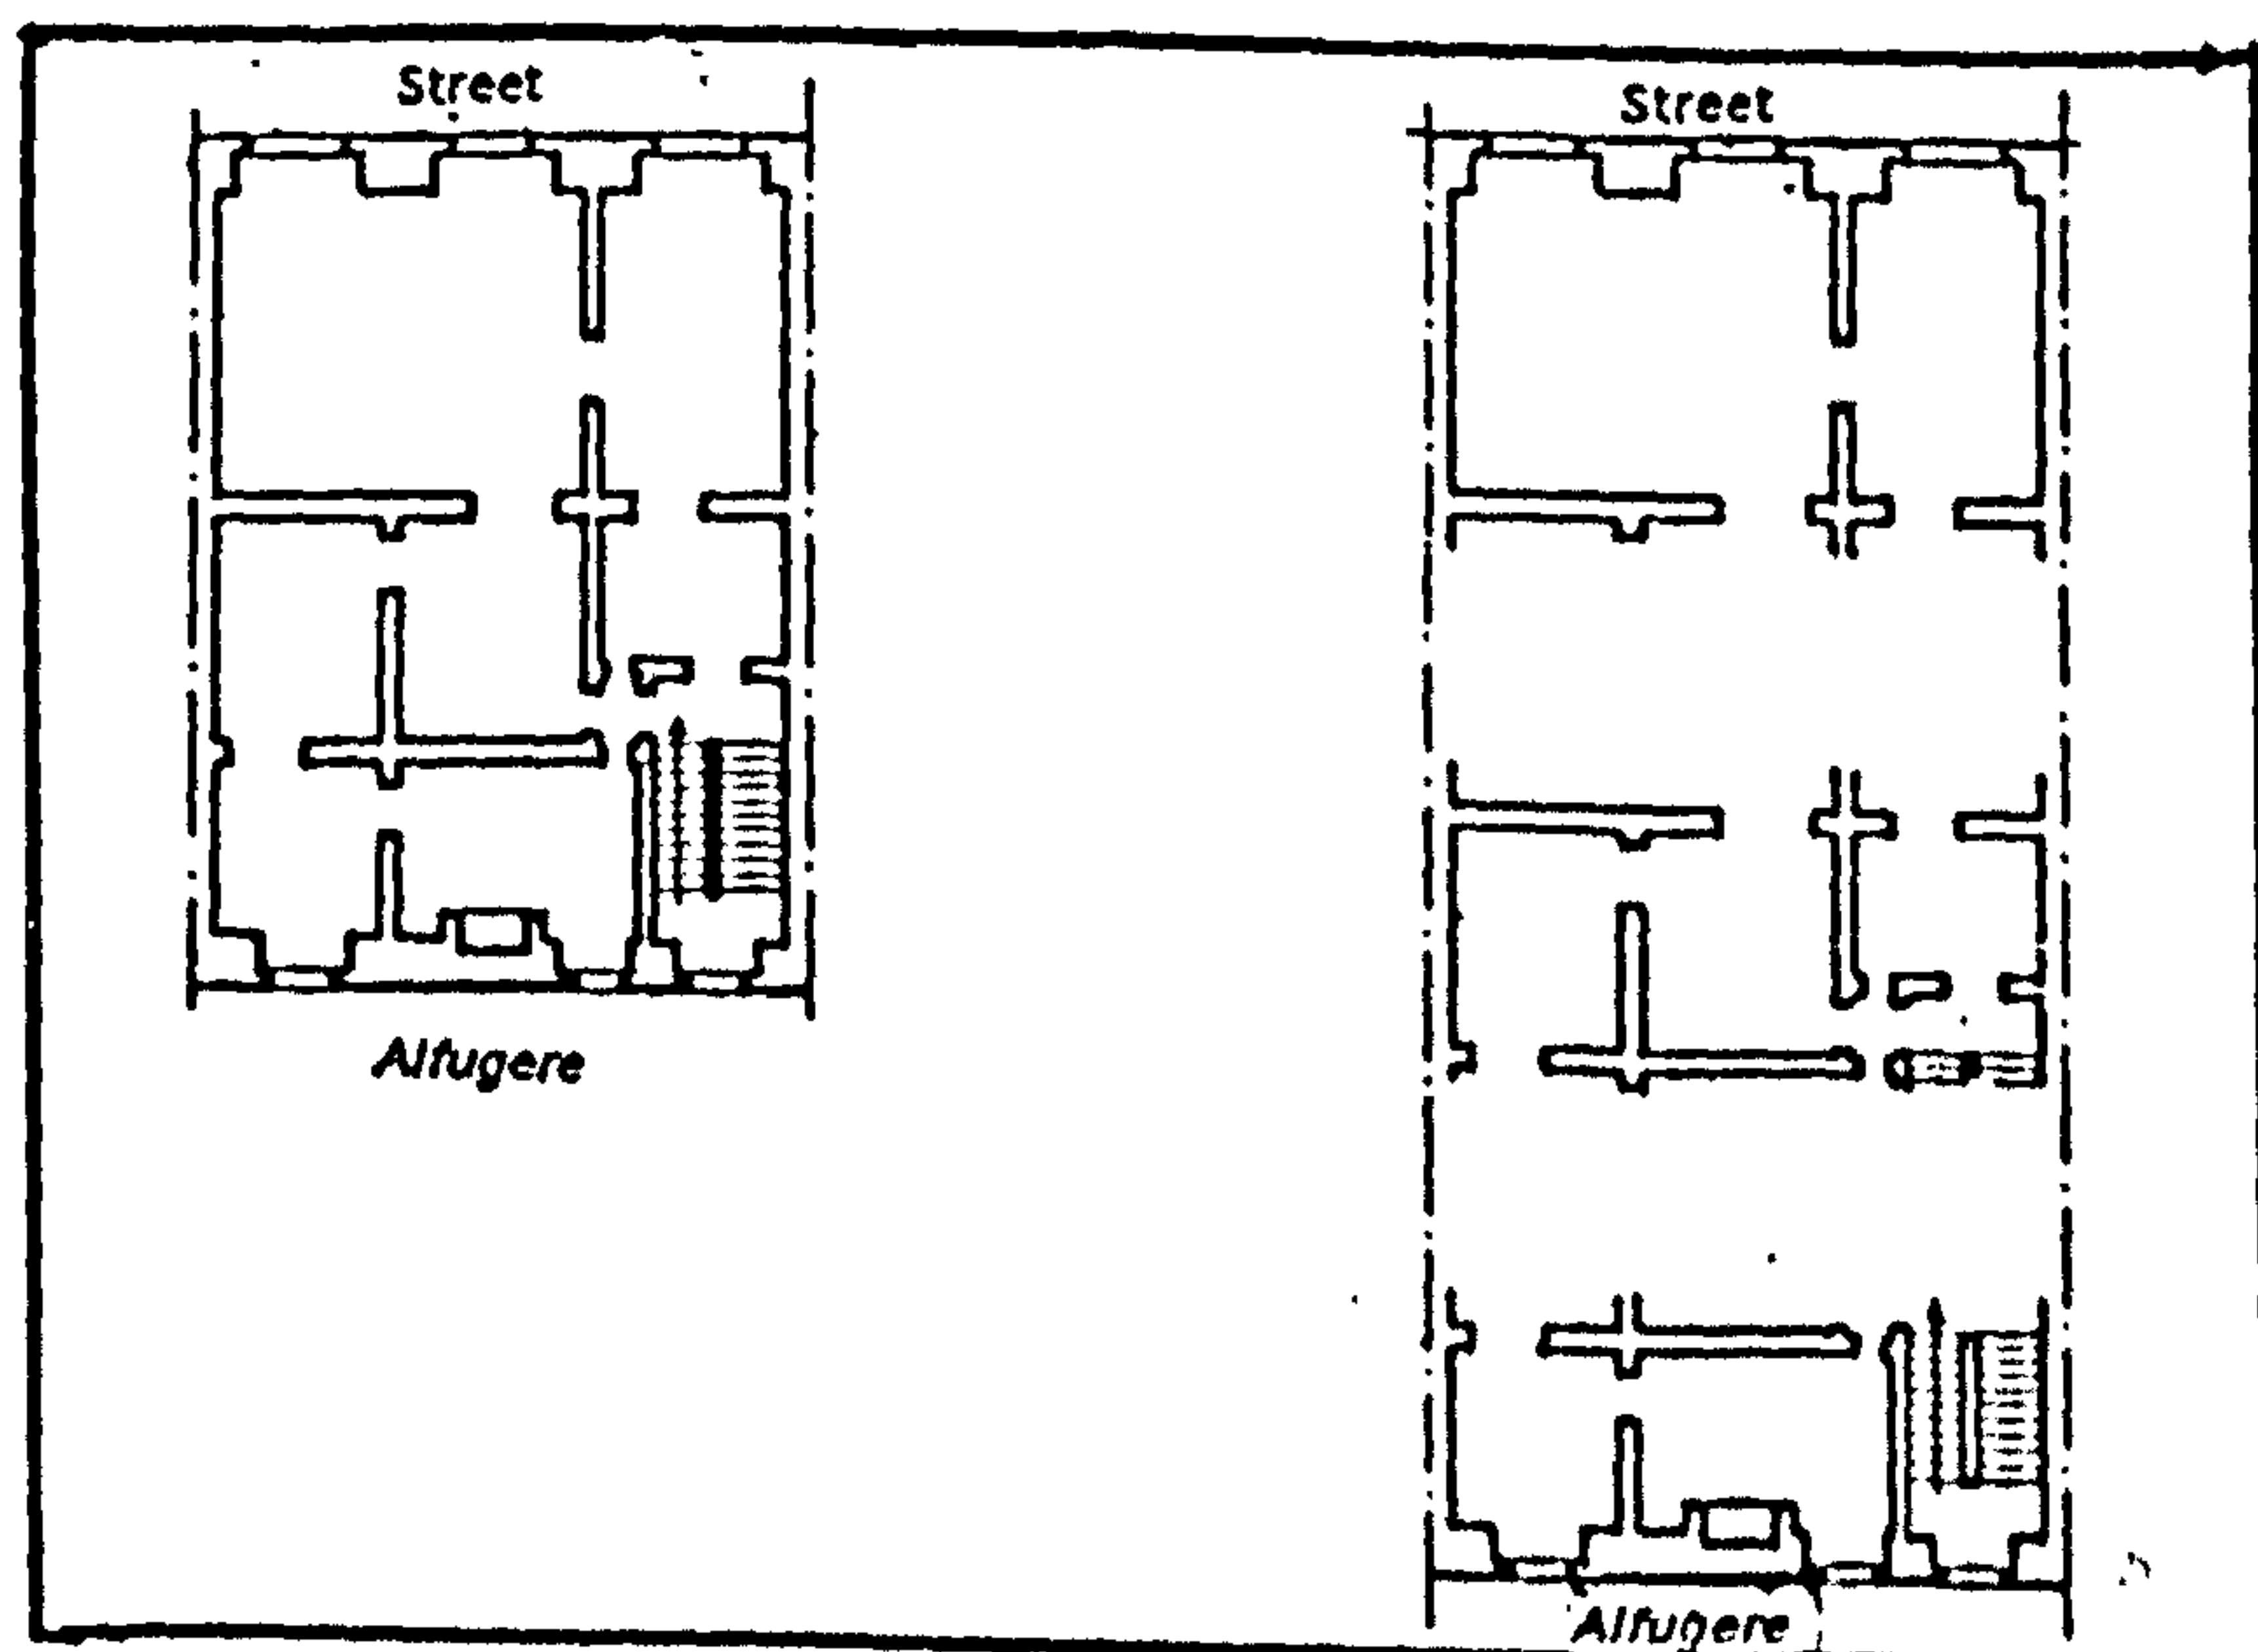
Pombaline building plan and a recent (1940-45) plan of a building in Lisbon
